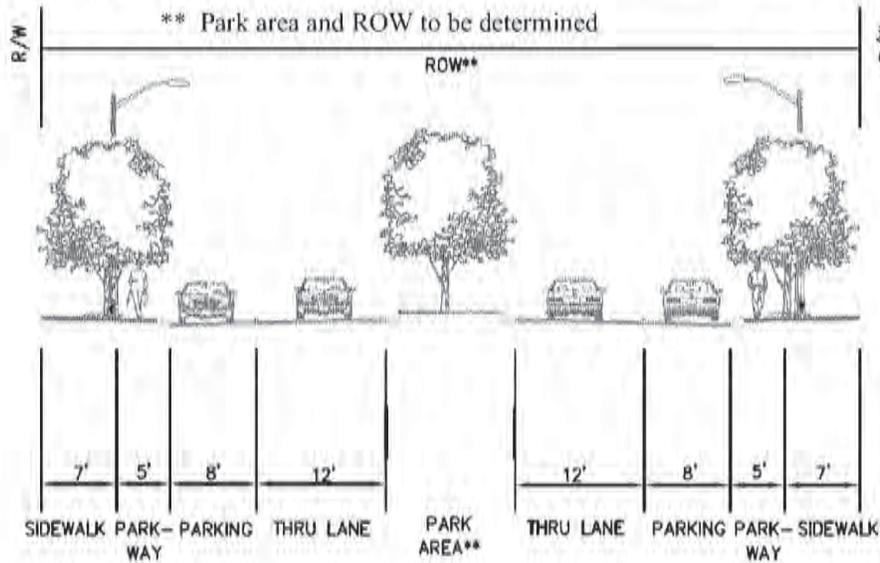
Proposed Cross Section, Entire Length of Woodlawn Avenue
